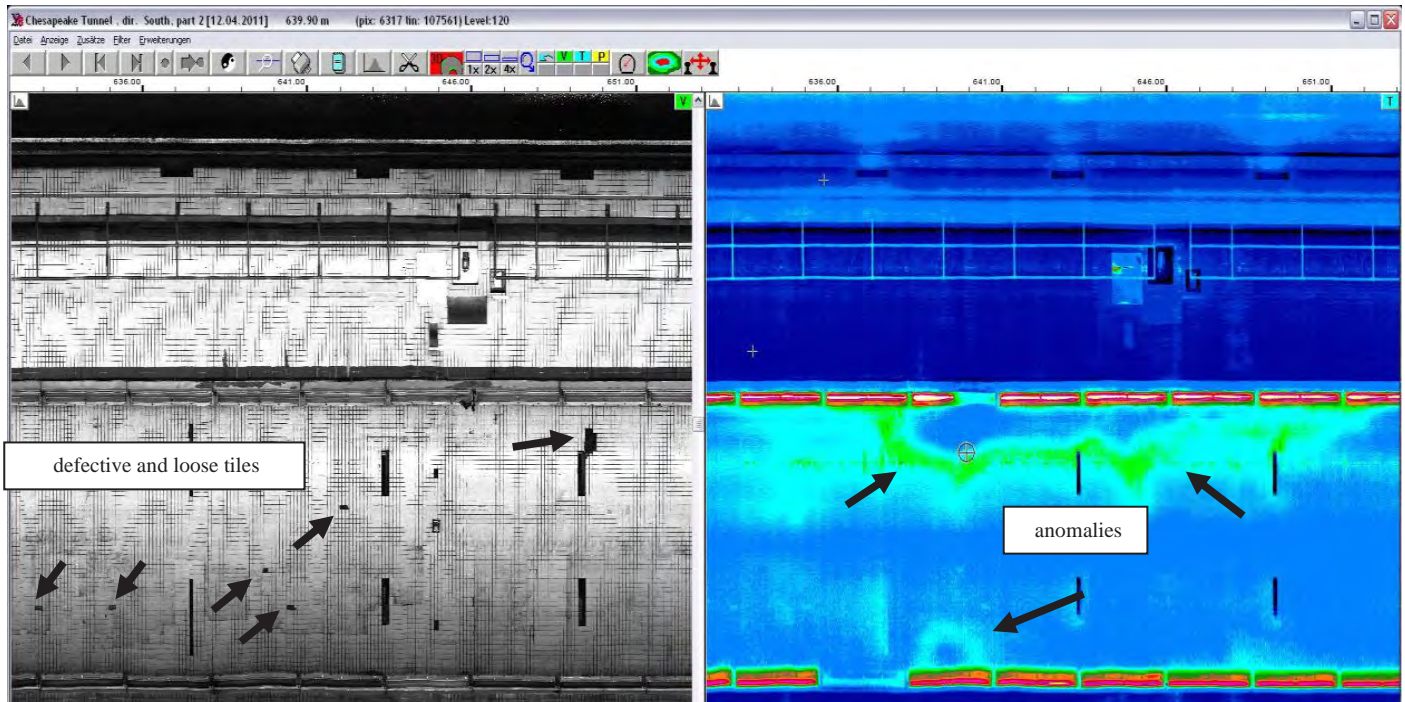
Loose tiles (left) and warmer temperature anomalies (right) in ceiling area (south, 636–652 m).
